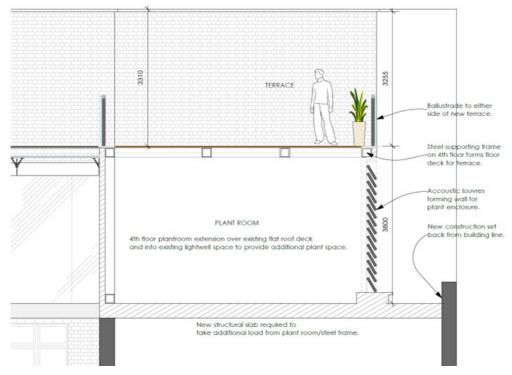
Abstract of the RCGP building, Camden Council 2024.
